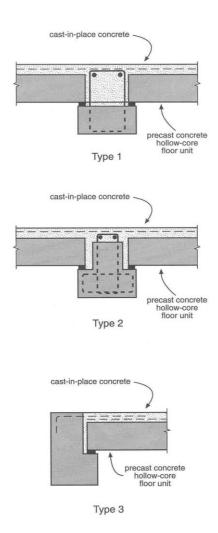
Precast beam types [Centre for Advanced Engineering, 1999]
